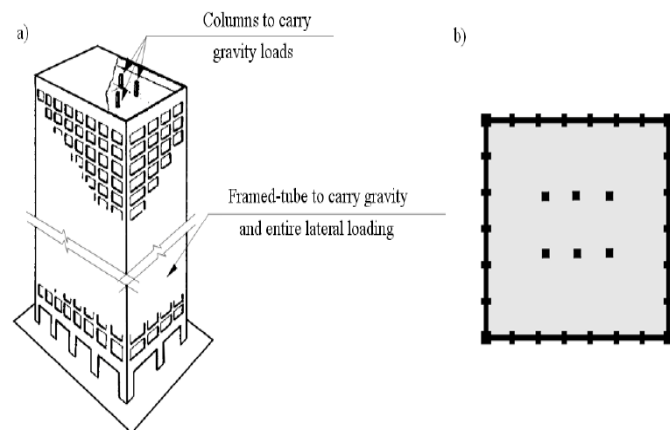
a) 3D view of Frame tube structure and b) sectional plan
